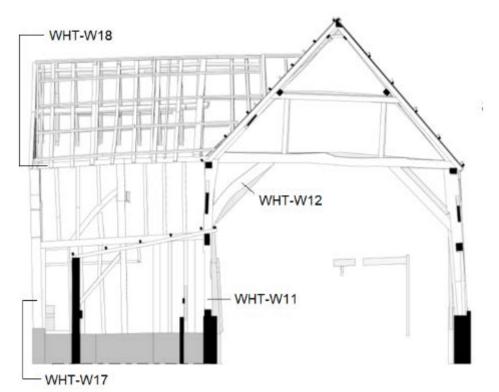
Section through Truss 5, east face, showing the sampled timbers, WHT-W11-12 and WHT-W17-18 (after ATD London Ltd)
